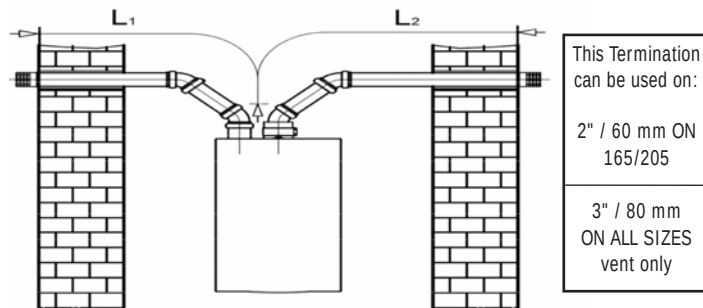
2" / 60 mm & 3" / 80 mm Twin Pipe Separated Horizontal Flue Termination
